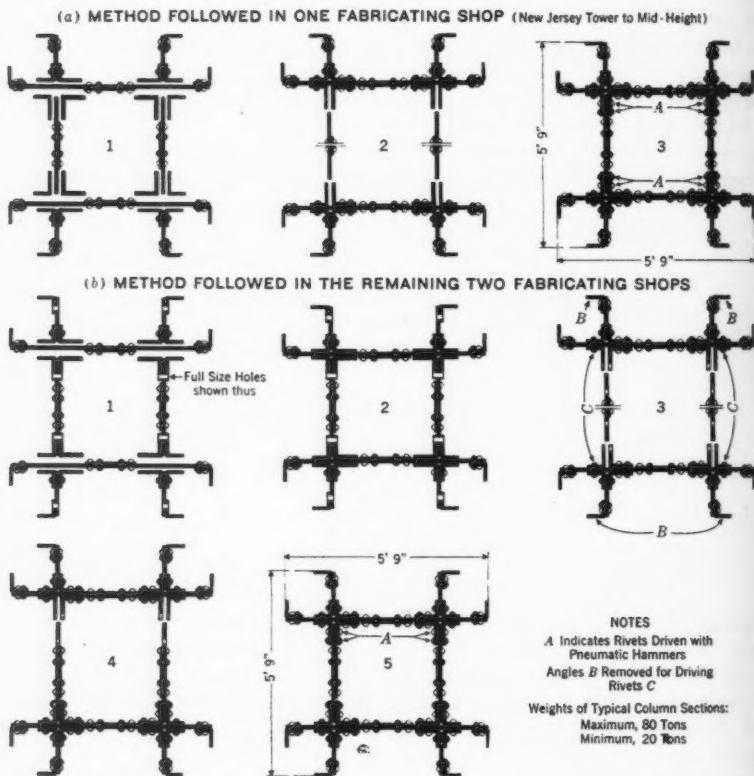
SEQUENCE OF PRINCIPAL FITTING OPERATIONS ON TYPICAL TOWER COLUMN SECTIONS.
